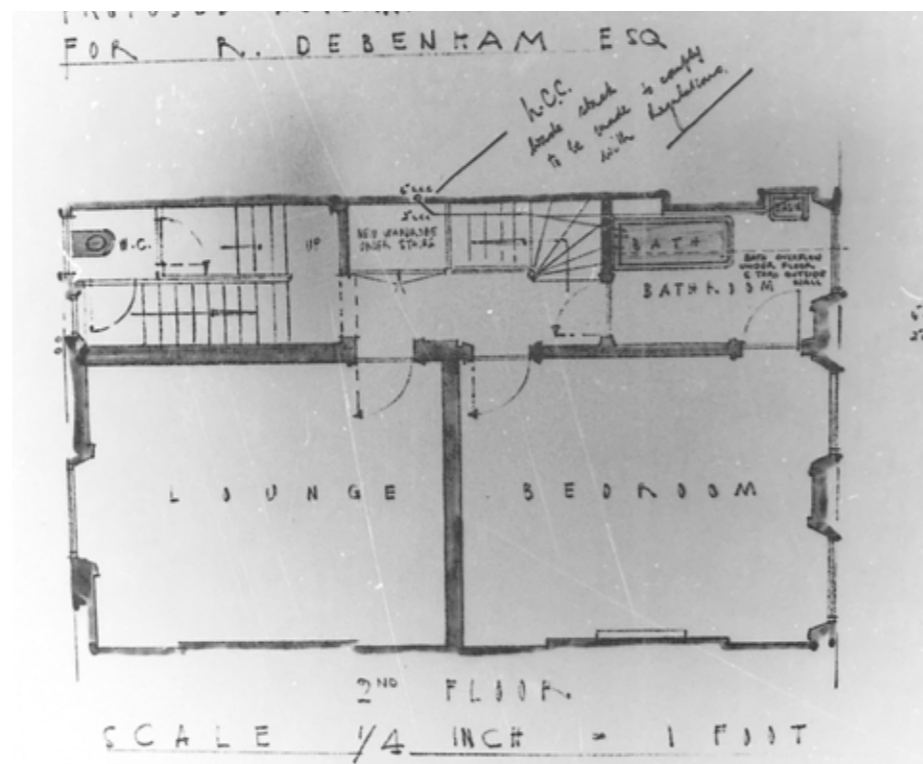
Plan of second floor of 8 Gloucester Gate, 1937.
